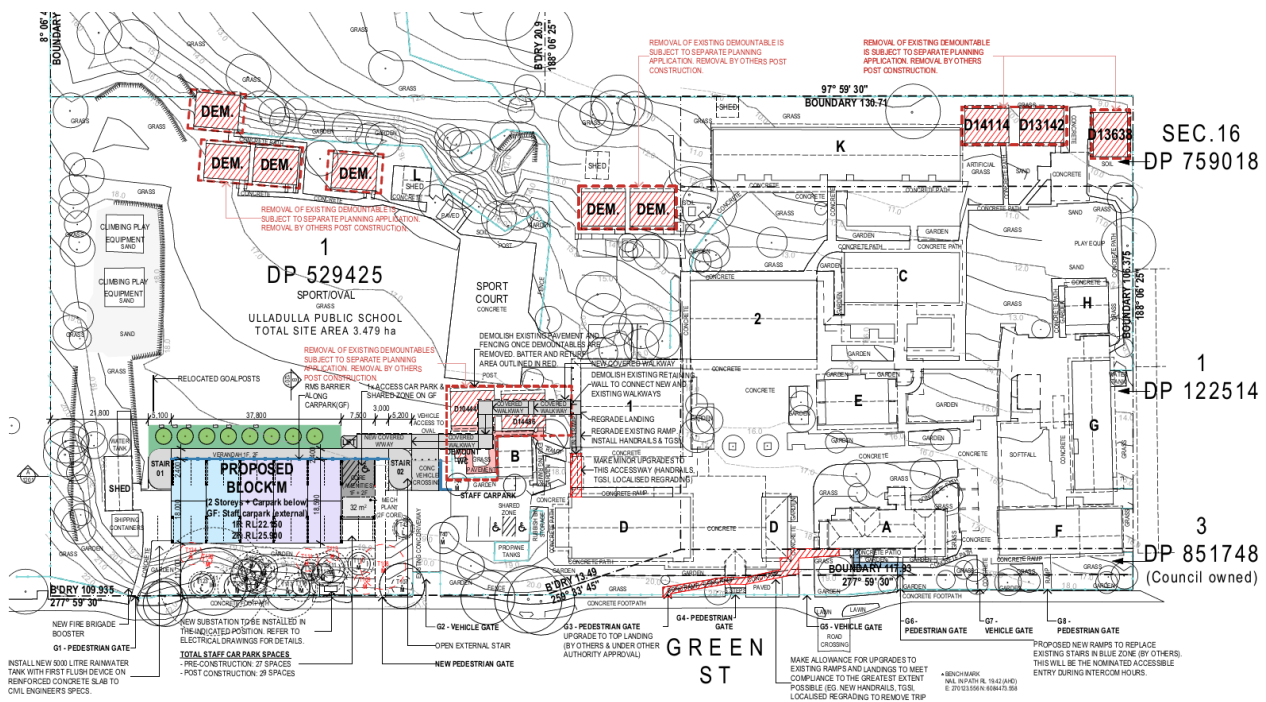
Site Plan (Source: Fulton Trotter, dated March 2025)
